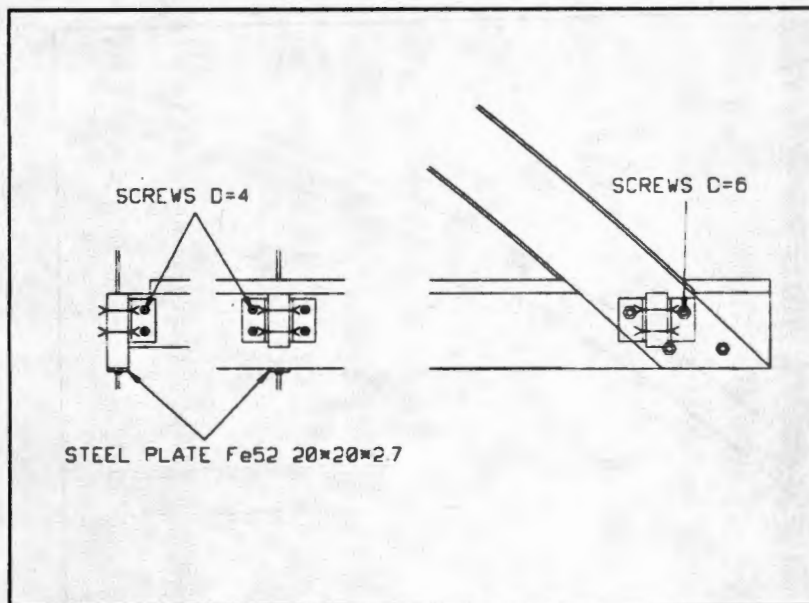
Connections between the crossbeams and the tension bar. Dimensions in millimetres.
